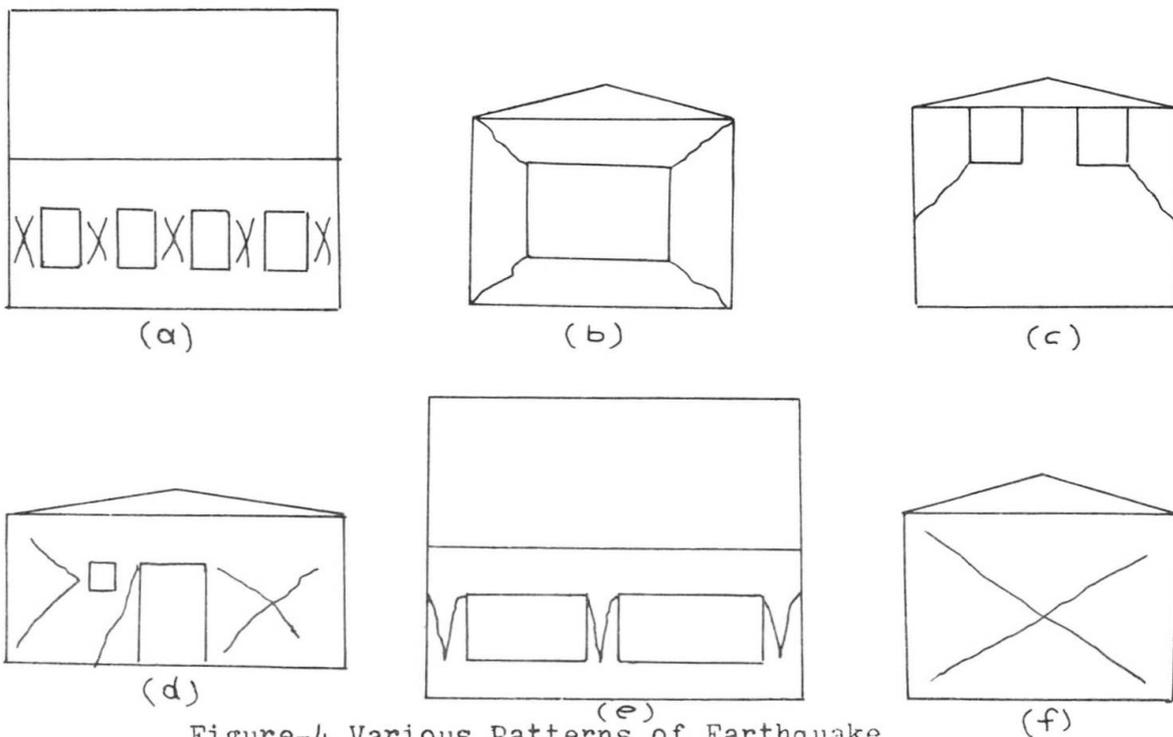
Various Patterns of Earthquake Cracking in Masonry Buildings
